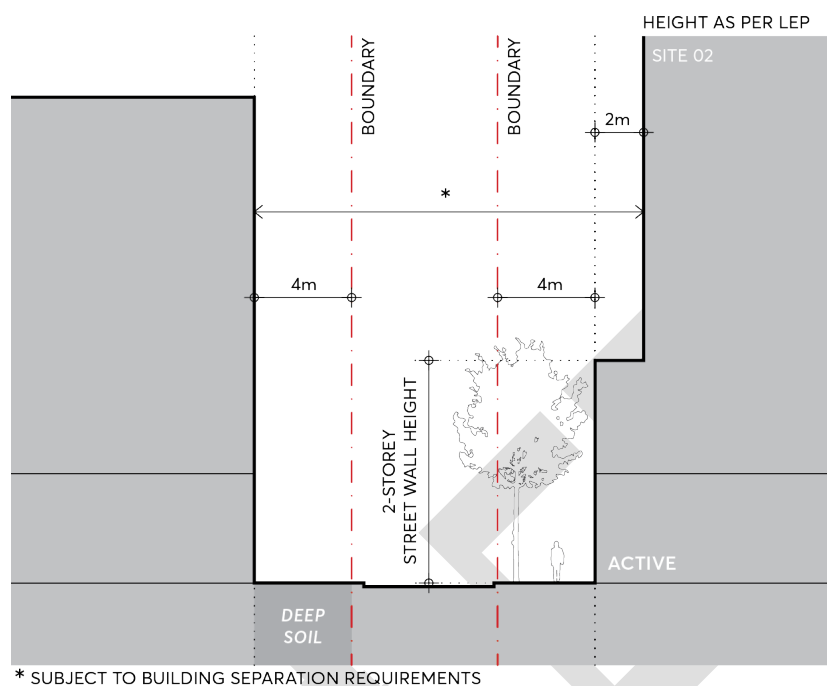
Station Lane (Section D) Setbacks and Street Wall Height
